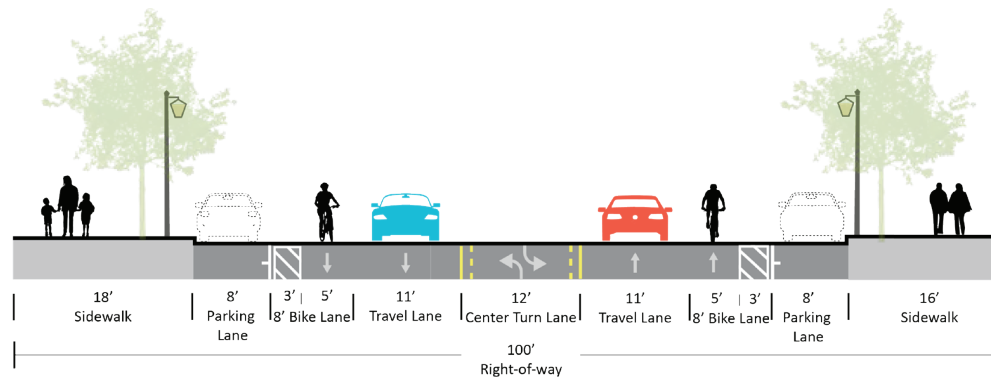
Roadway Cross Sections - Downtown Streets: Beaumont Ave.
